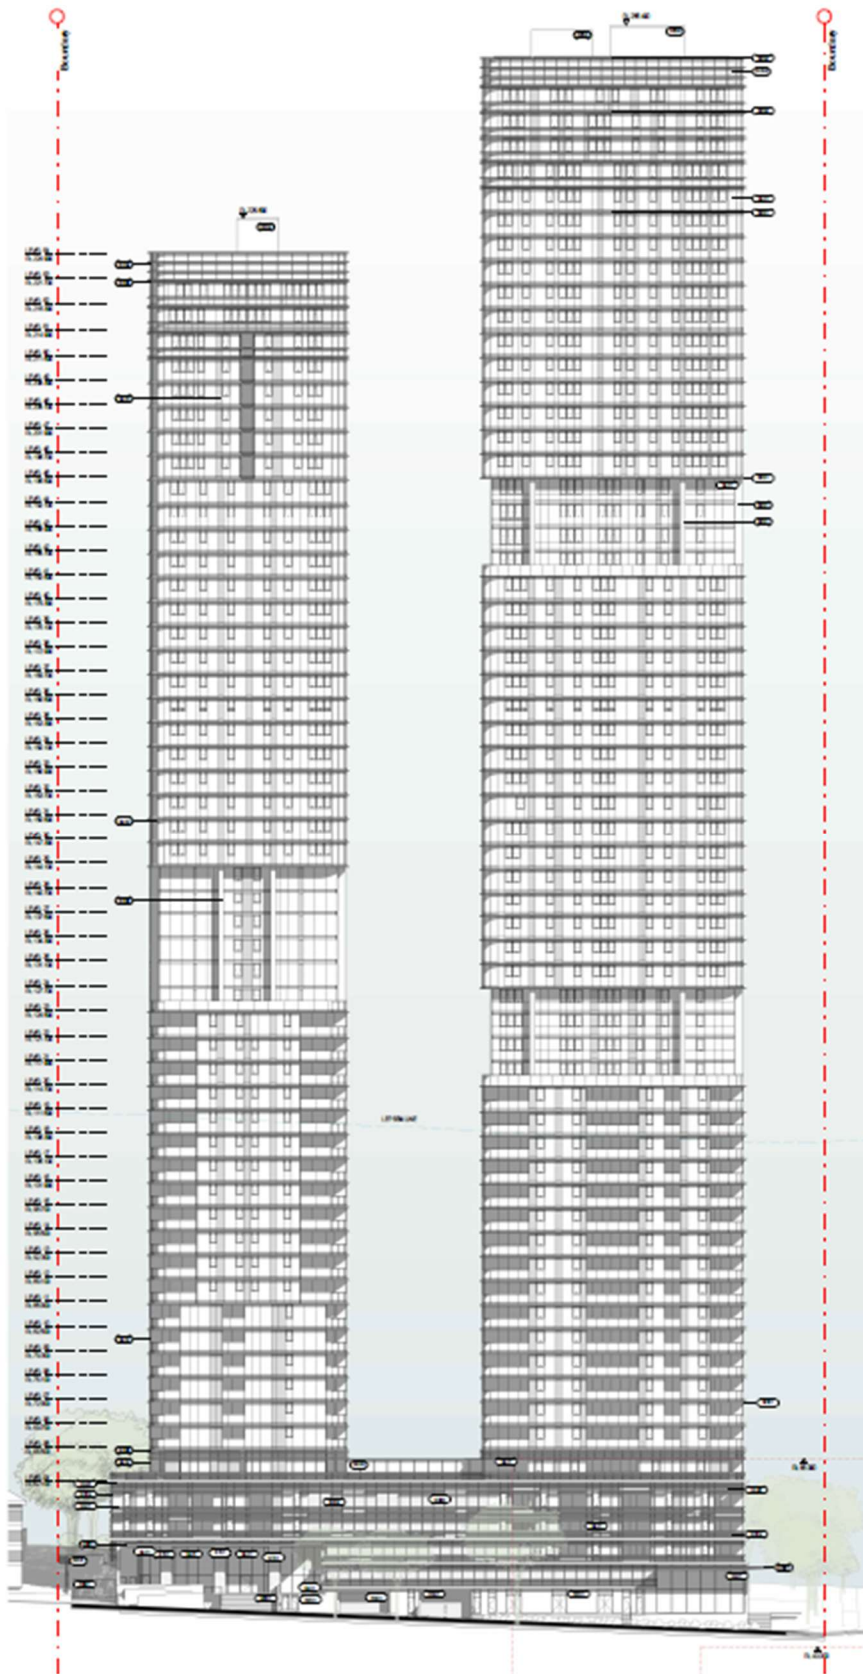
Extract of proposed plans: East Elevation (DA3101)
